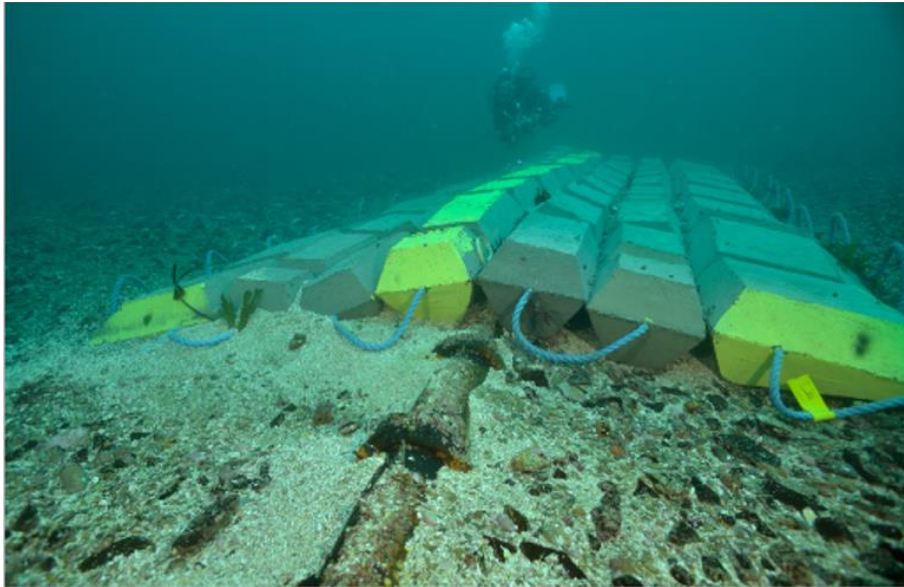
Iron shells and a concrete 'mattress' used to protect an unburied cable at a French tidal turbine test site
